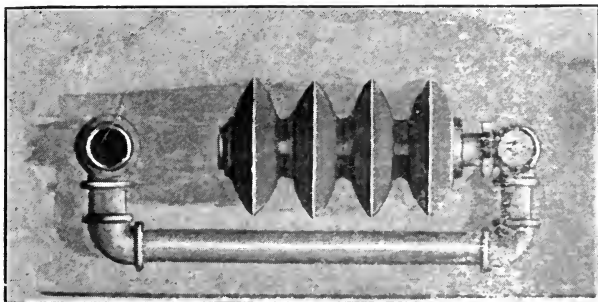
Used in Office Buildings; Good Form for Fireproof Buildings.
